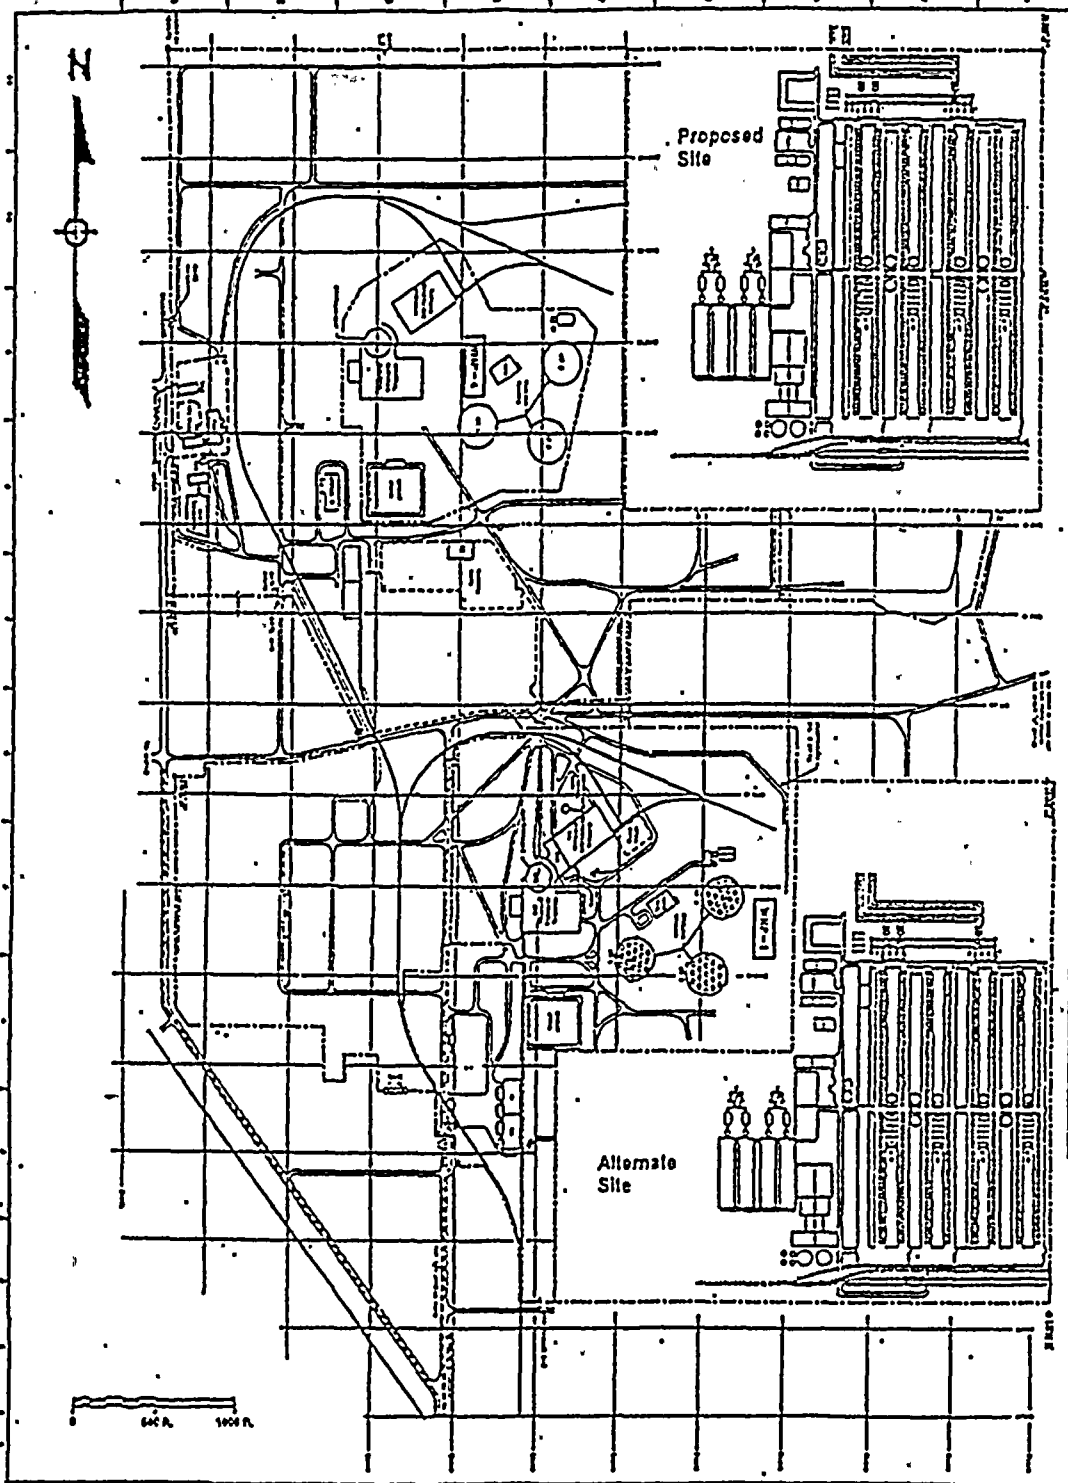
Proposed Siting for Aluminum Smelter Plant.
